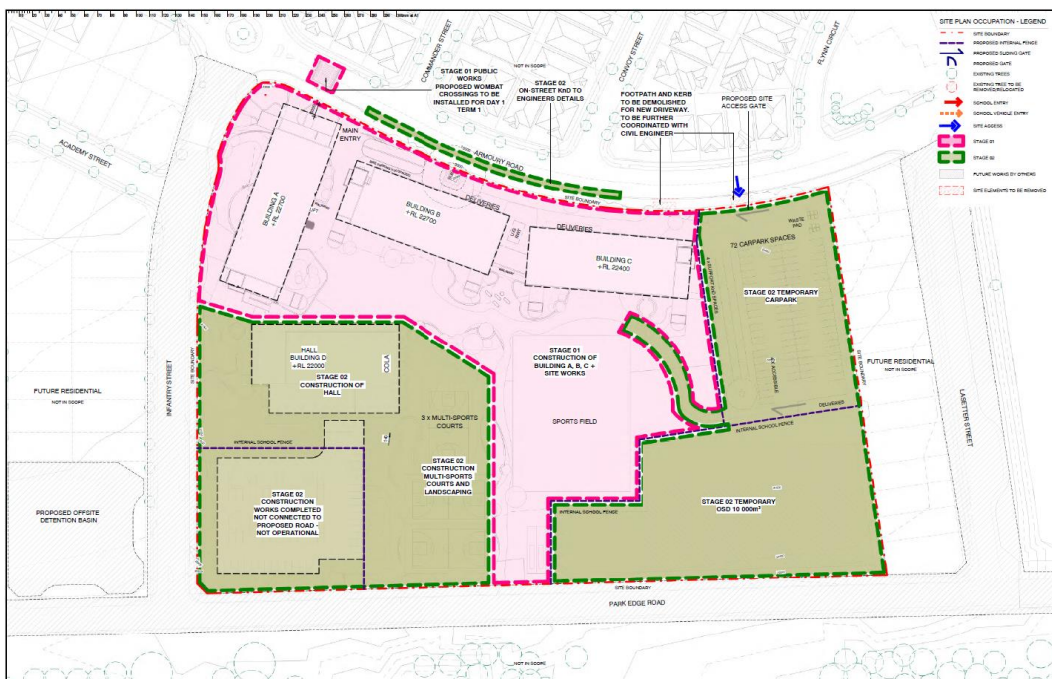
Stage 1 and Stage 2 with temporary works construction plan (Source DJRD)
